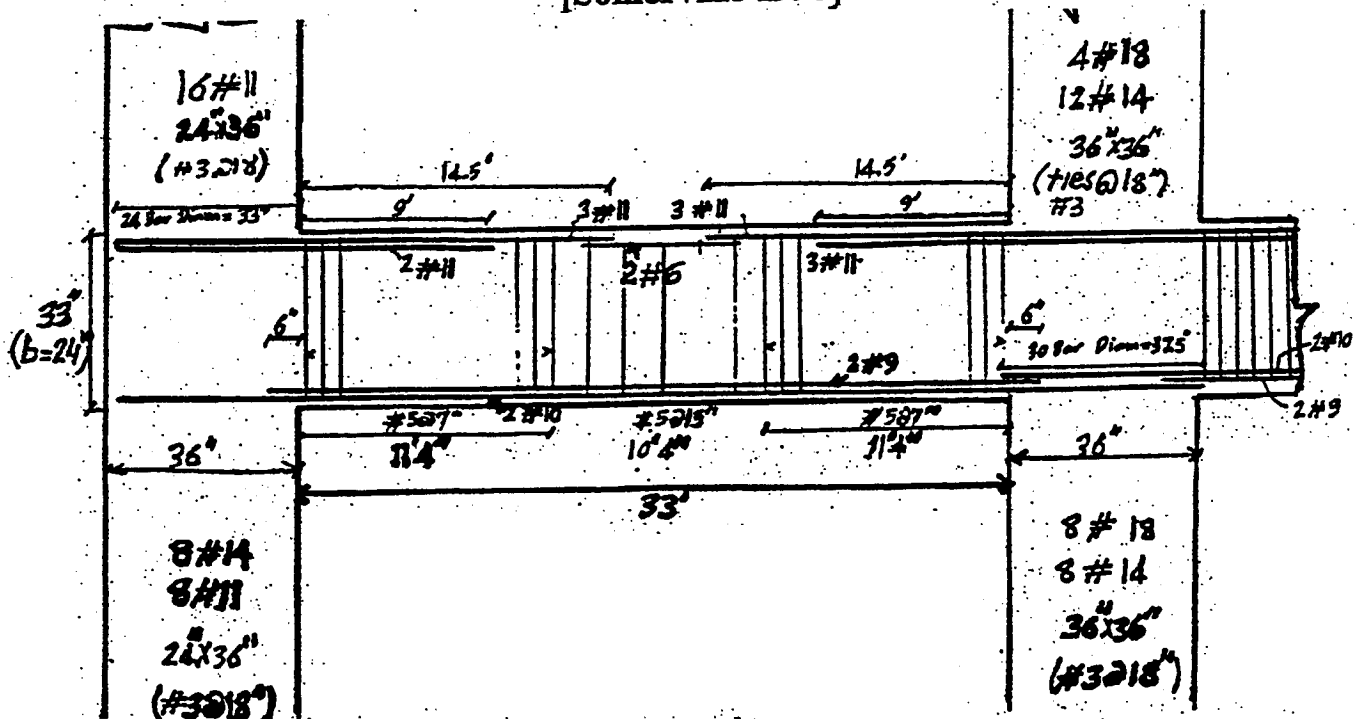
Reinforcement details for the 3rd floor beams of interior transverse frames. (Similar beam reinforcement is used at the 4th and 5th floors.)
